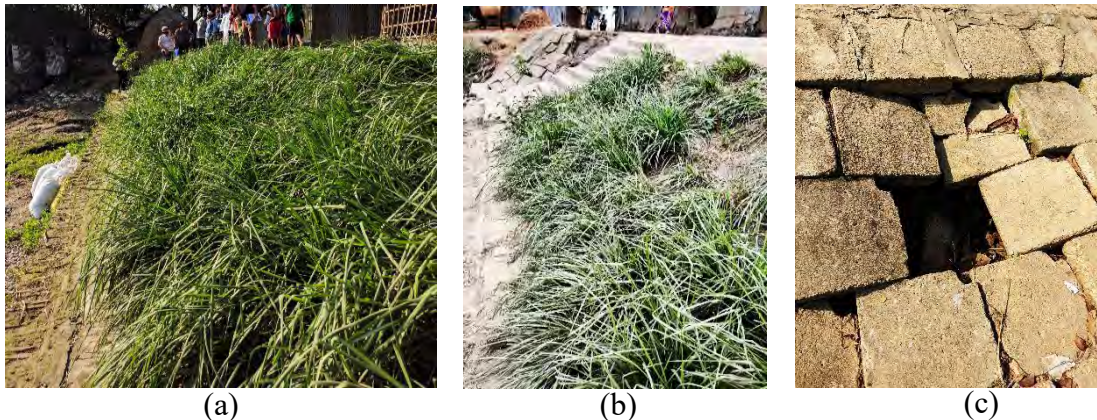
Photographs of Protection Type III at Chowganga, Itna, Kishoreganj; (a) Slope Condition after Facing One Monsoon; (b) after Facing Two Monsoons; and (c) Slope Condition by Protection with Solid Blocks
